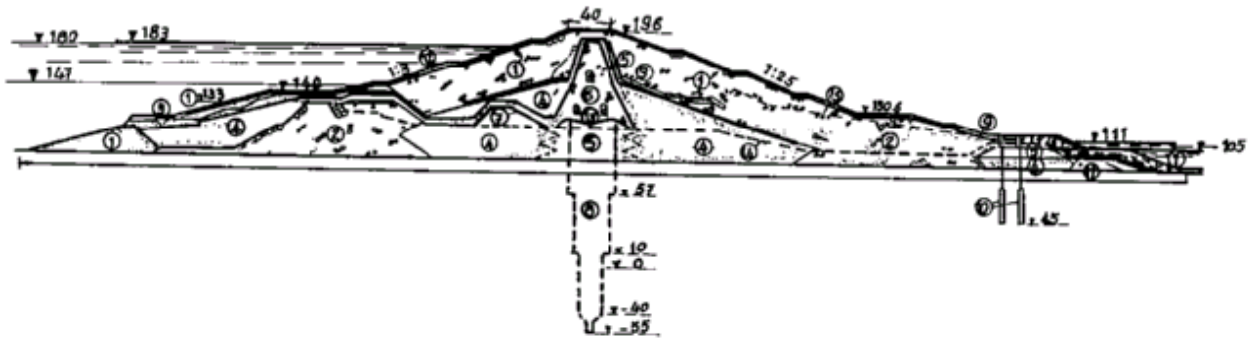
Oroville dam cross section (after Banerjee et al, 1979).
